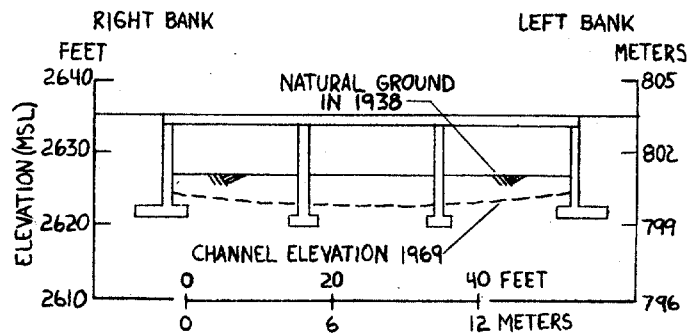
Changes in channel bed elevation between 1938 and 1969.
